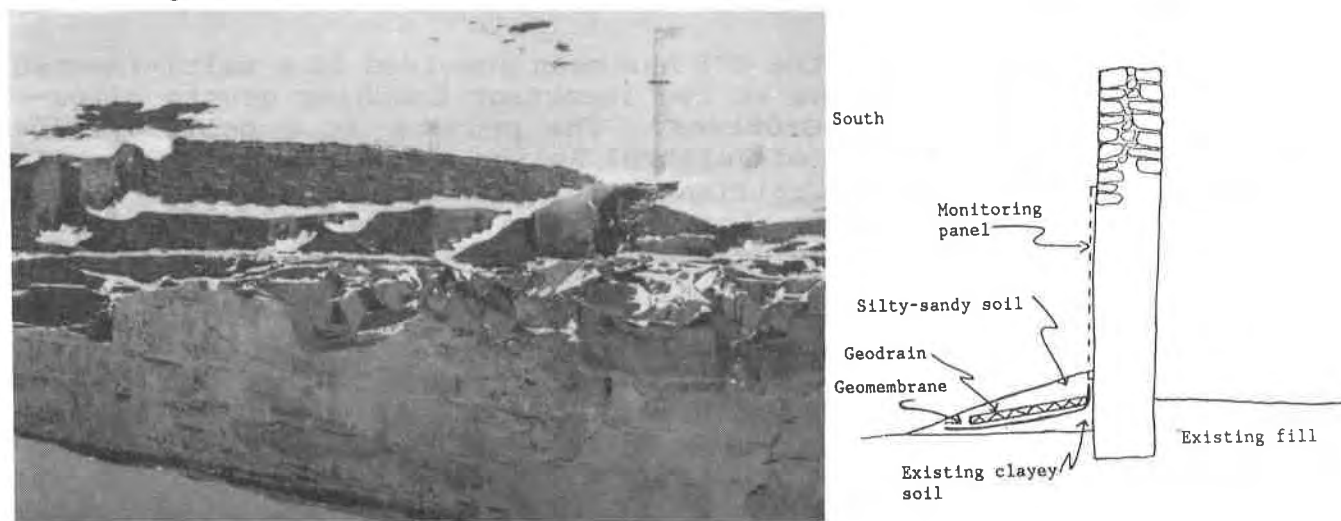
Basal Protection: Snow accumulation at the bases and tops of walls during winter months (left); the cross-section (right) shows installation of geodrain to protect the base of walls.
